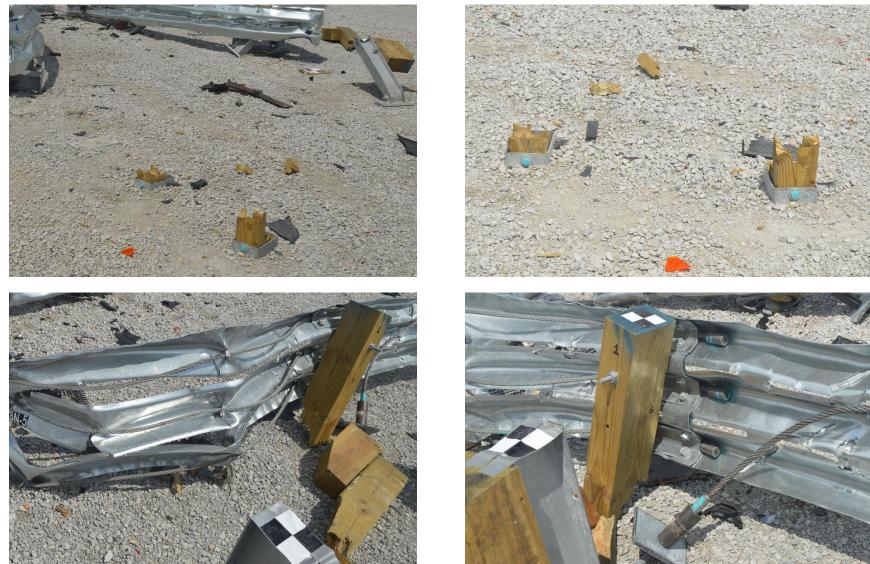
Damage to System at Post Nos. B1 and B2, Test No. MSPBN-5
